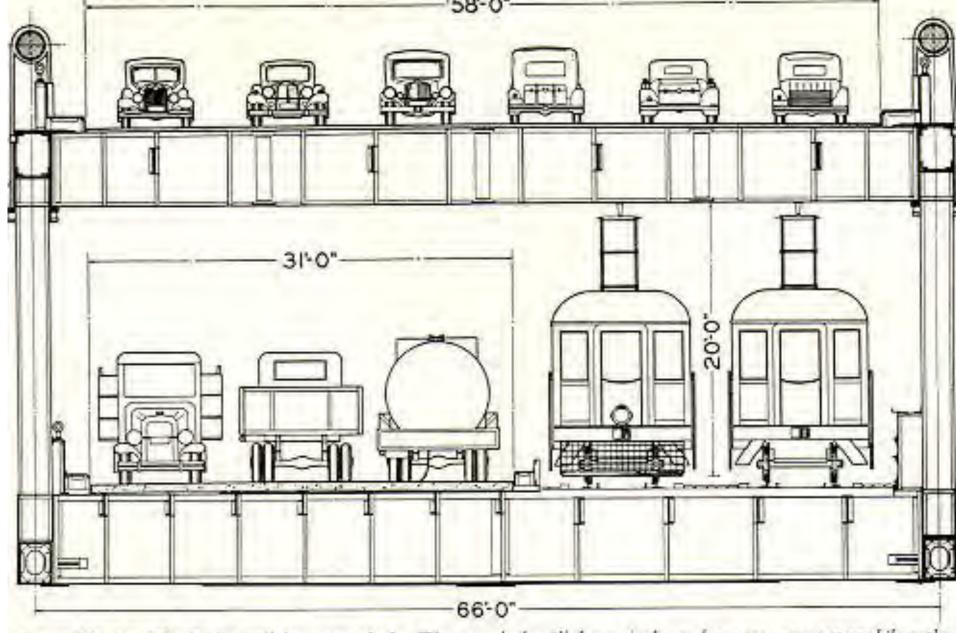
The bridge will have two decks. The top deck will have six lanes for passenger automobiles; the lower deck will have three lanes for trucks and buses—it will also have two standard gauge electric railway tracks.
